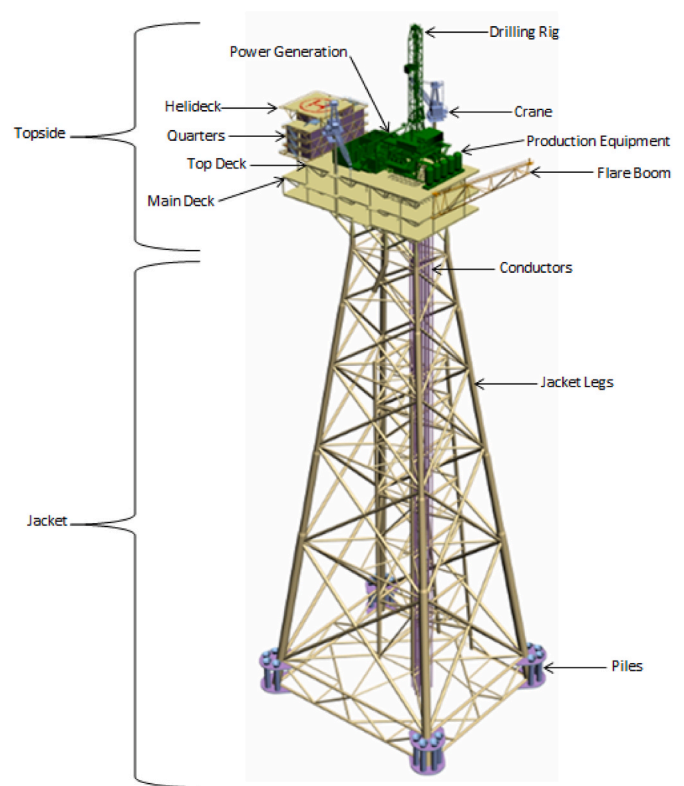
Typical components of a fixed jacket oil and gas platform..
